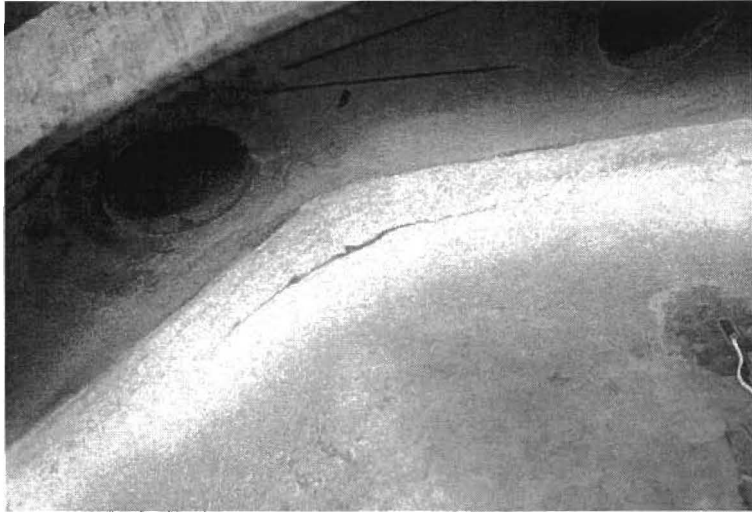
Photograph of fatigue crack adjacent to bolt B in HMIP 4 1/2 UNC laboratory specimen.
